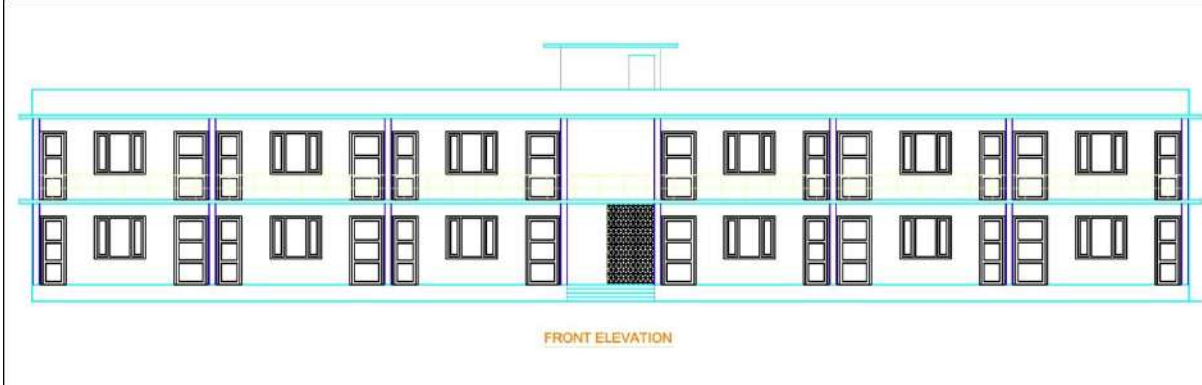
FRONT VIEW OF SCHOOL BUILDING, JALPADEVI HIGH SCHOOL
